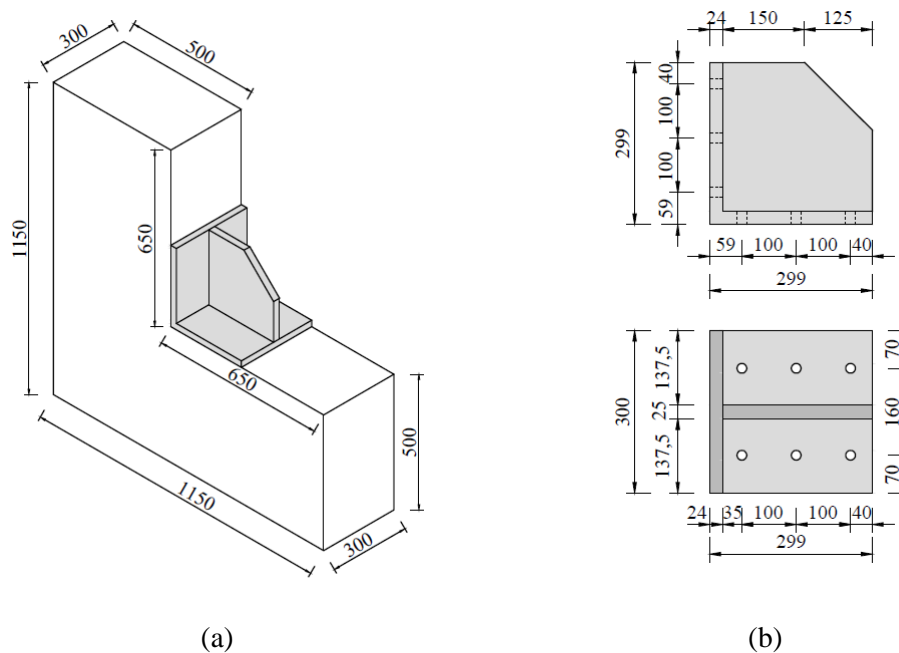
Dimensions (in mm) of (a) the concrete specimen and (b) the anchor bracket and gusset plate connection
